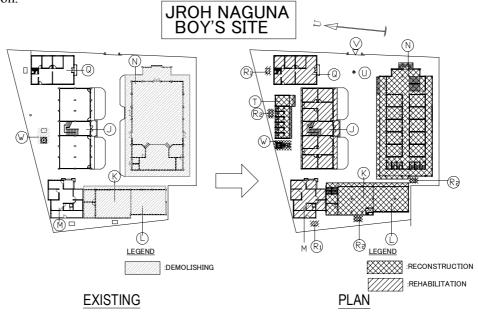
Site Plan and Rehabilitation Plan for Jroh Naguna Orphanage (Boy's Site)
